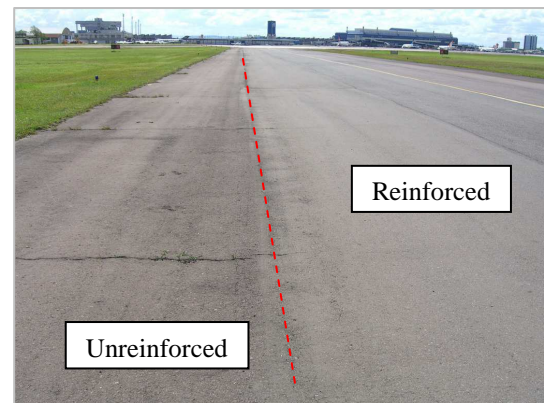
Joints of the concrete slabs reflect in the area where no reinforcement was used
